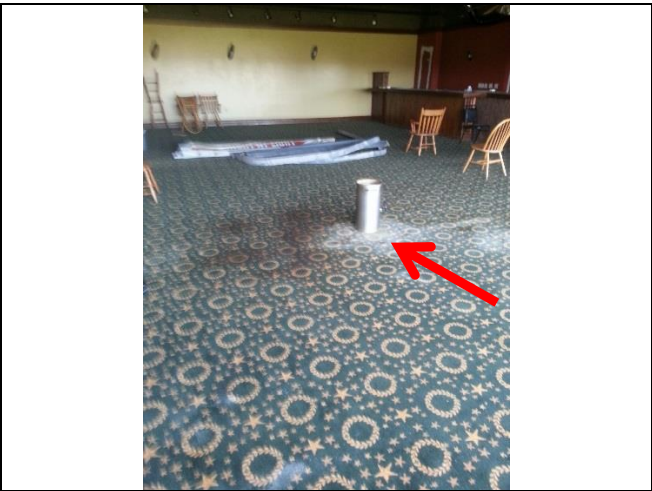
Additional location of roof leak with pot catching water and stained/damaged carpeting.
